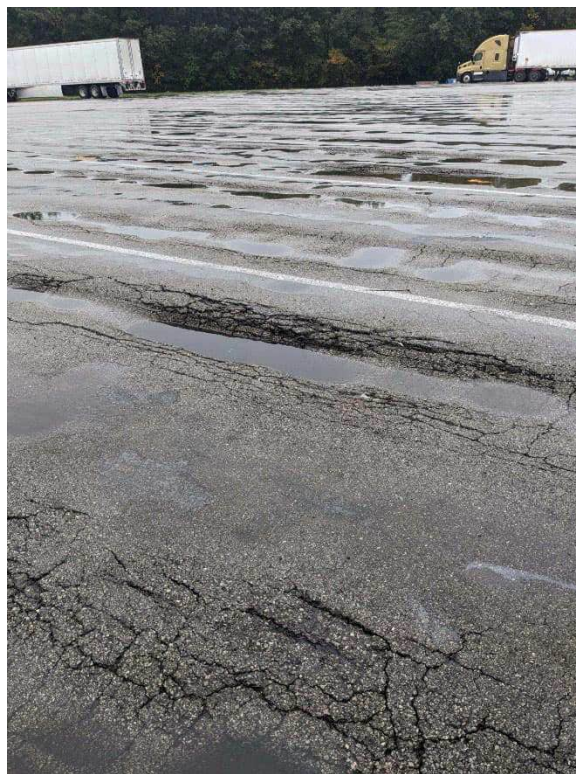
Typical pavement condition in westbound truck parking plaza (north side of ITR).
